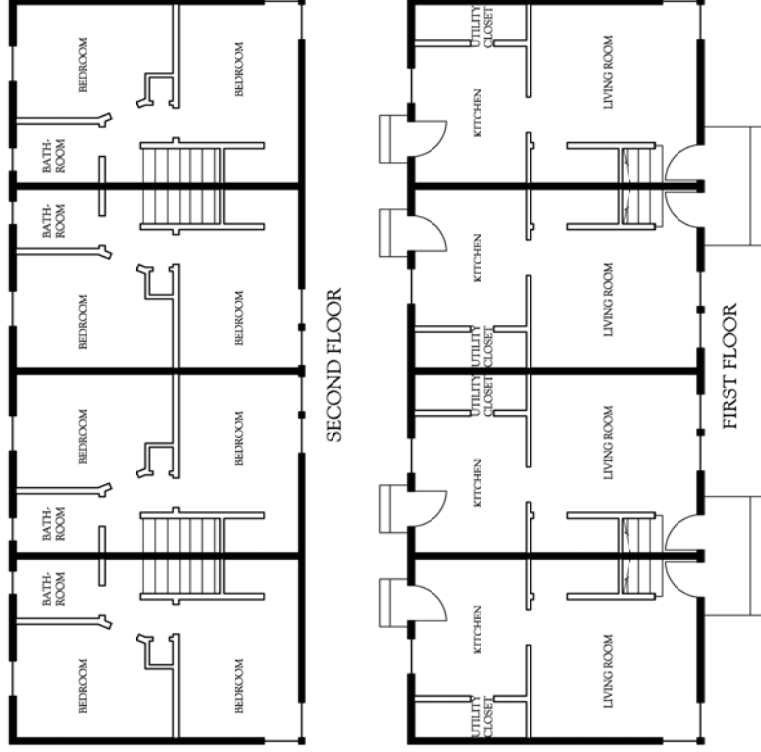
Floor plan of Residential Unit Type 4 (not to scale).
